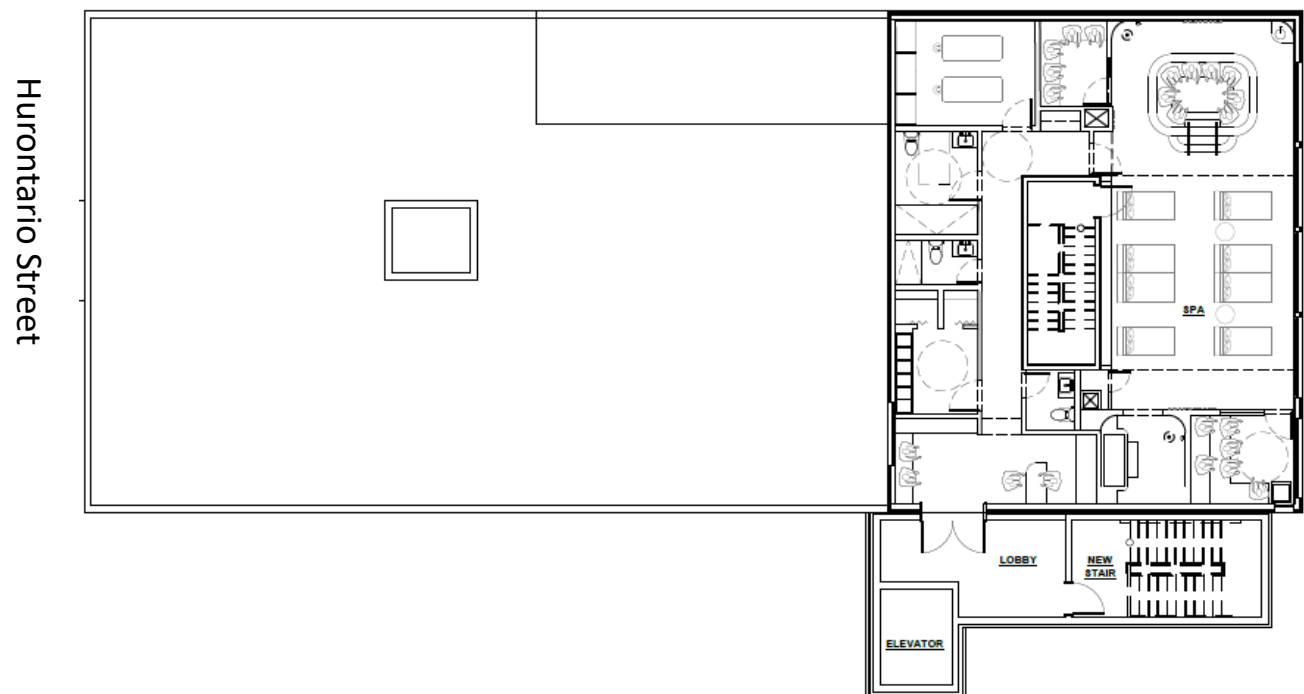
Proposed fourth floor plan (Waddell Engineering Ltd.).
